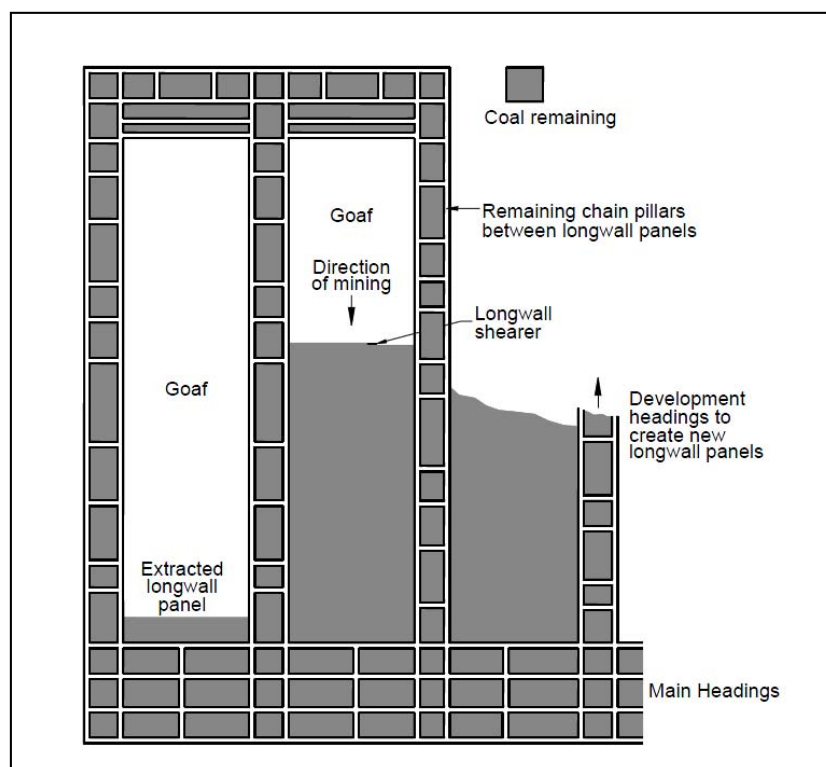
Typical Plan View of a Series of Longwall Panels (From “Introduction to Longwall Mining and Subsidence – Mine Subsidence Engineering Consultants, 2007).
